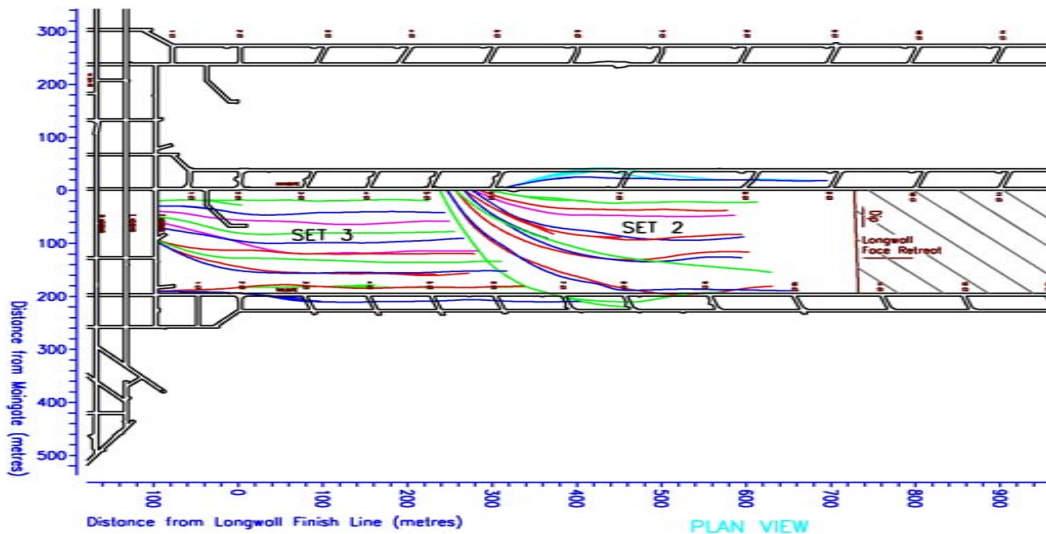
A typical location and plan of horizontal holes in a longwall panel
